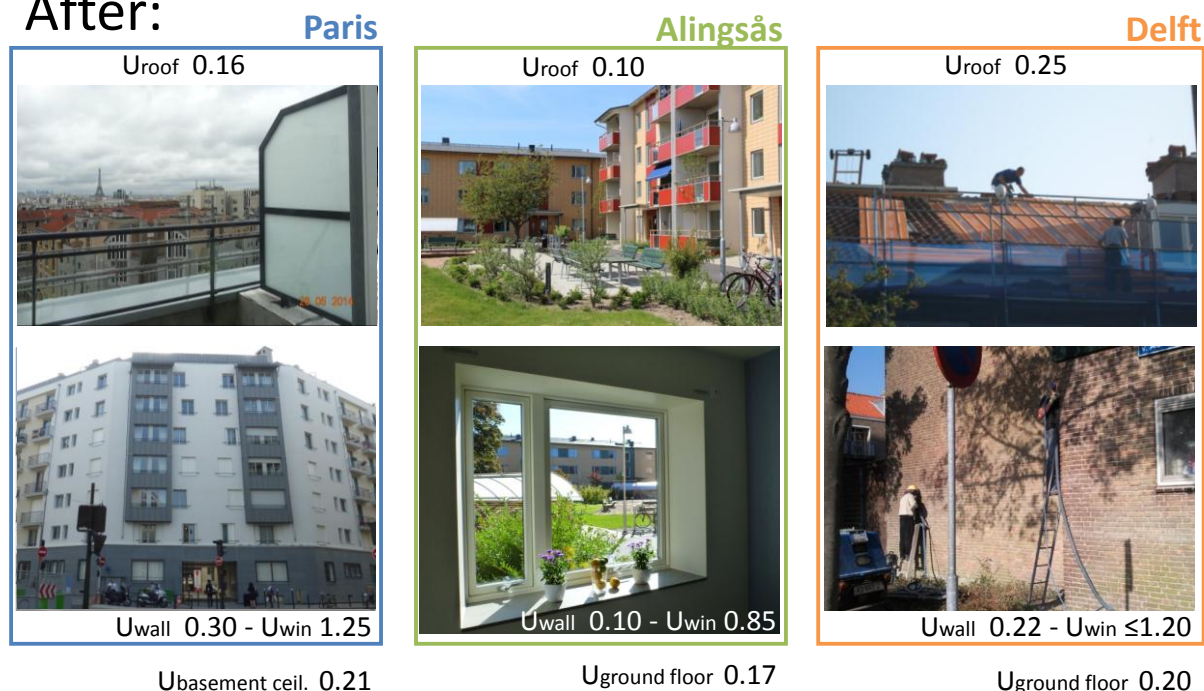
Building envelope after retrofit: Illustrations and U values [4] of the retrofiting of exterior walls, façades, windows and roofs for Paris, Alingsås and Delft respectively.
